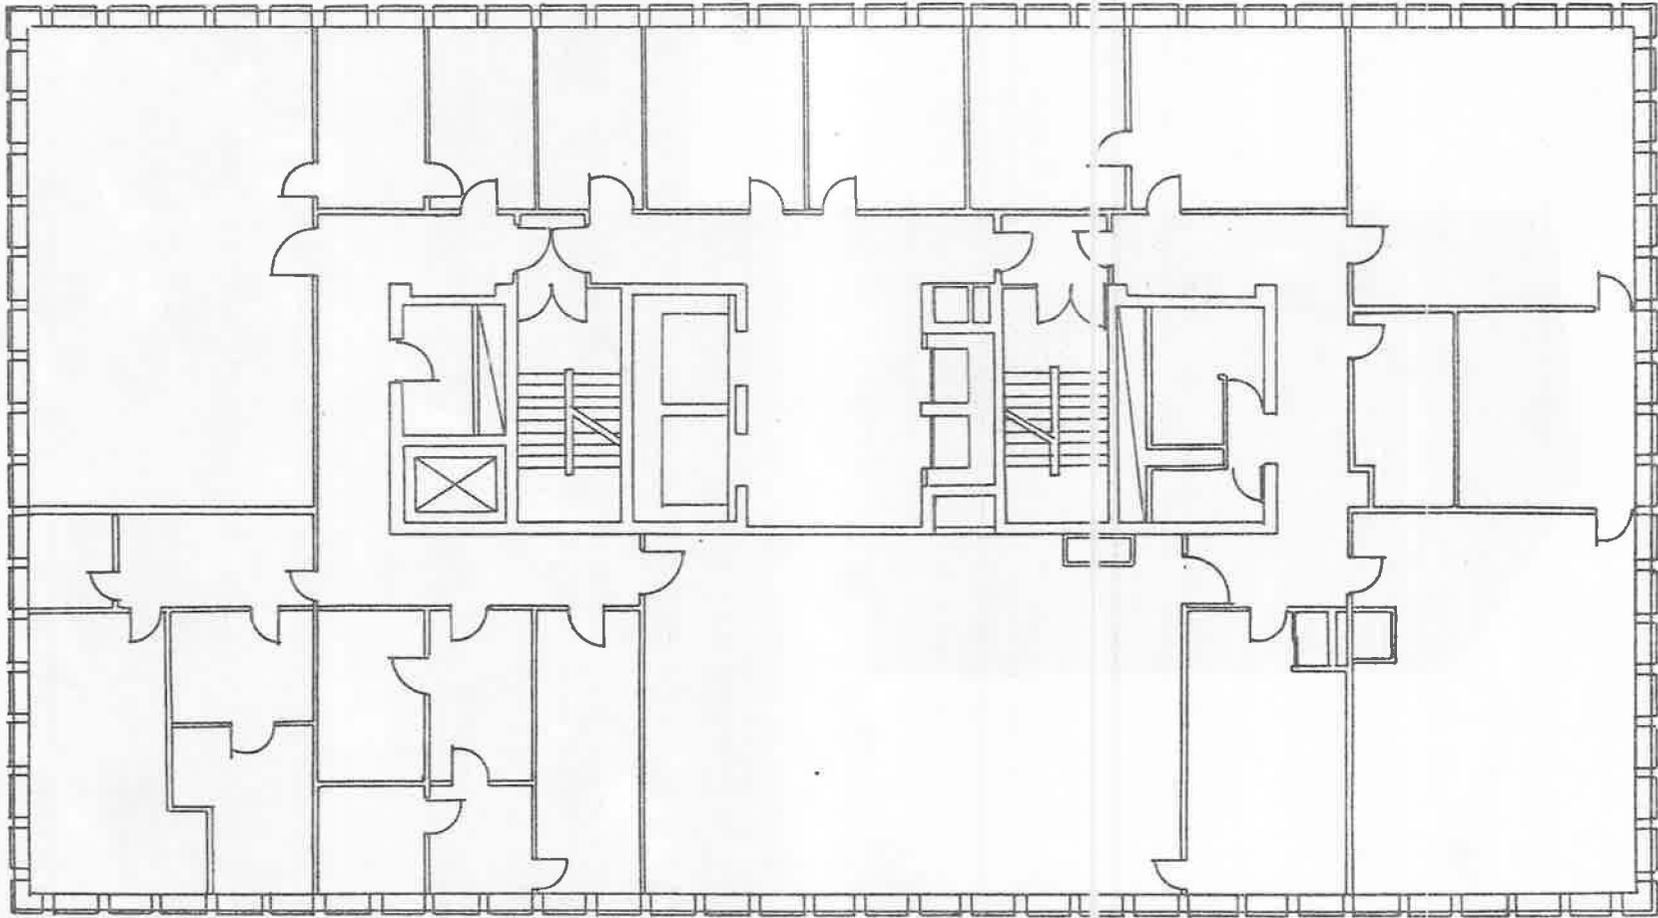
TYPICAL FLOOR PLAN OF THE ARTS BUILDING
